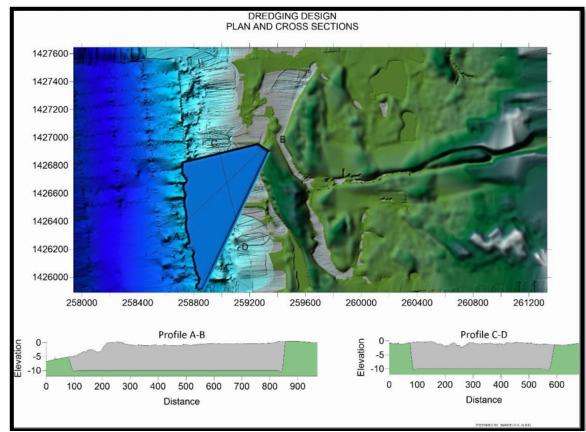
Plan view and cross sections of the dredging design within the Patrick River Delta.
